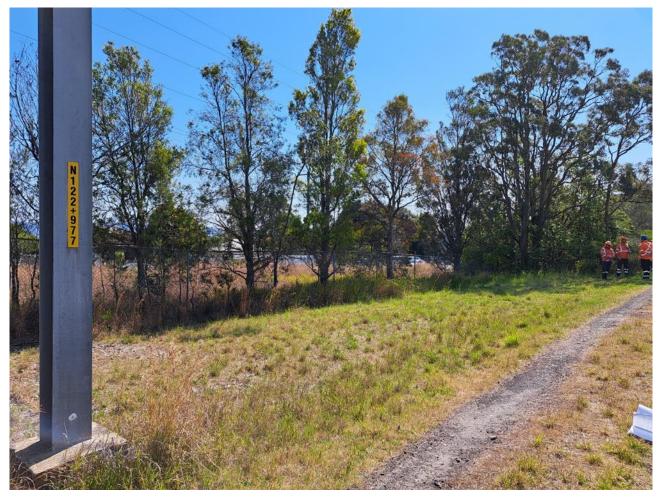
Site of MT11, looking north-west towards Dora Street in the distance.
